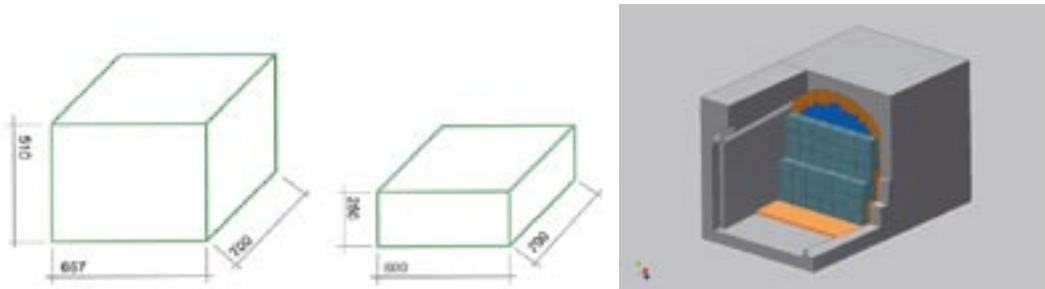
Block dimensions. An example of offsetting of blocks is shown to the right.
